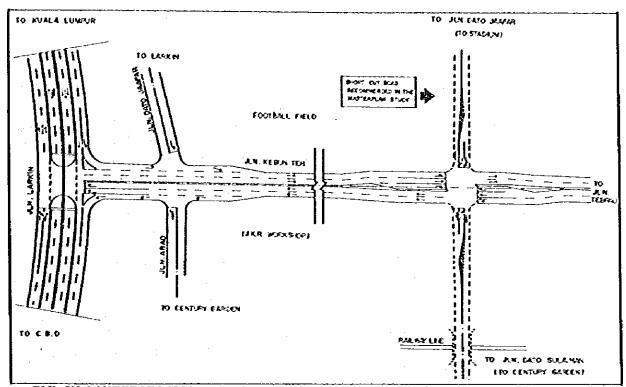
INTERSECTION IMPROVEMENT PLAN AT THE INTERSECTIONS OF JLN KEBUN TEH WITH JLNLARKIN AND JLN ABAD (PLAN 'A')
